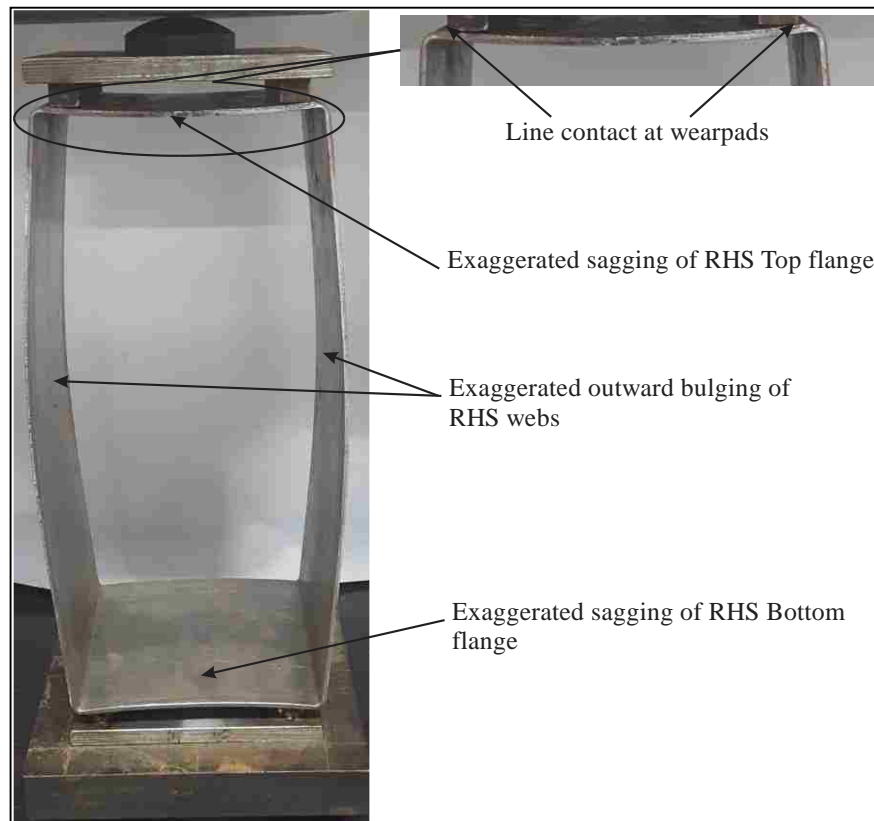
Exaggerated web and flange deflection RHS piece between wearpads
